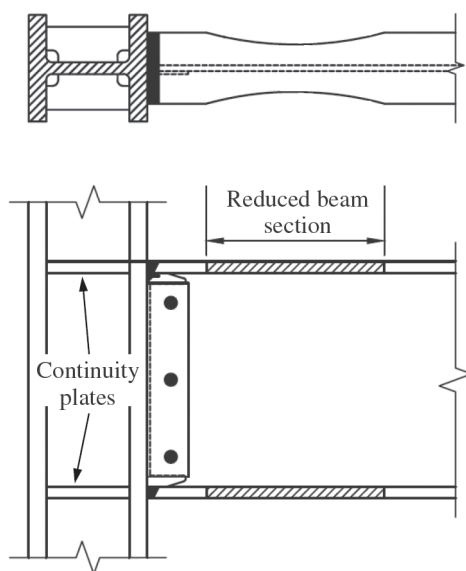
Reduced beam section (RBS) moment connection with continuity plates.
